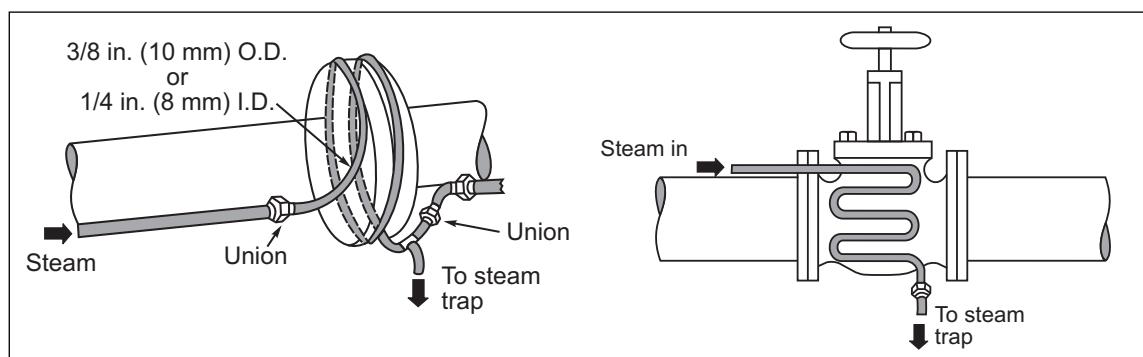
Steam tracer on a flange, on a straight pipe and a valve
